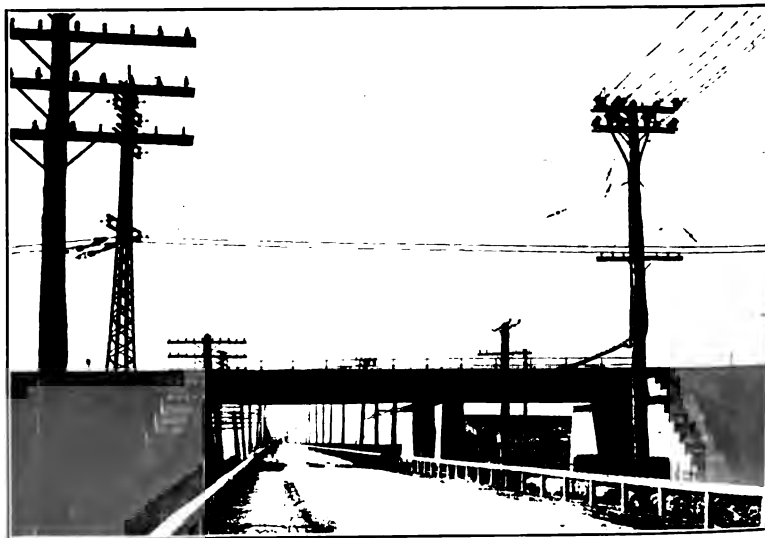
26,000-VOLT CABLE CROSSING UNDER RAILROAD BRIDGE AND
